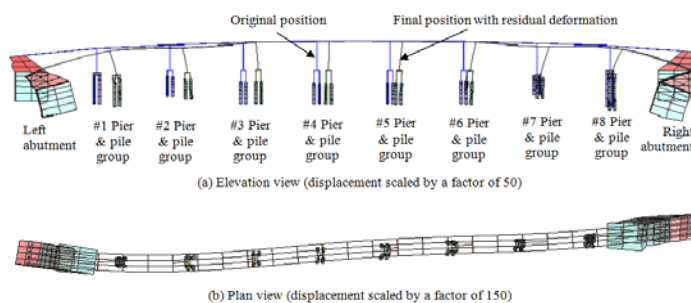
Elevation and plan views of the bridge system after earthquake shaking (Yan 2006).
